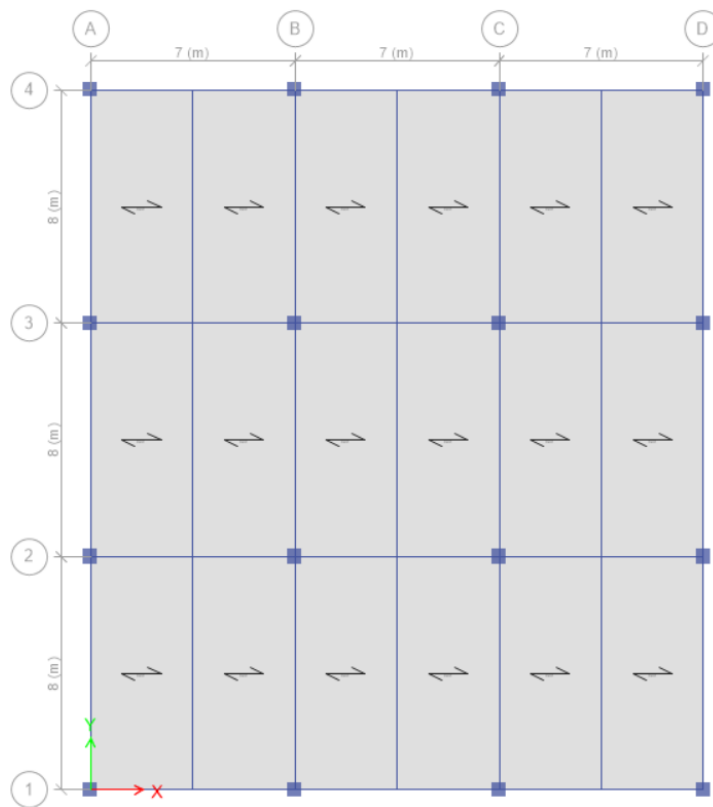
Plan view for both one-way solid slab and composite slab.
